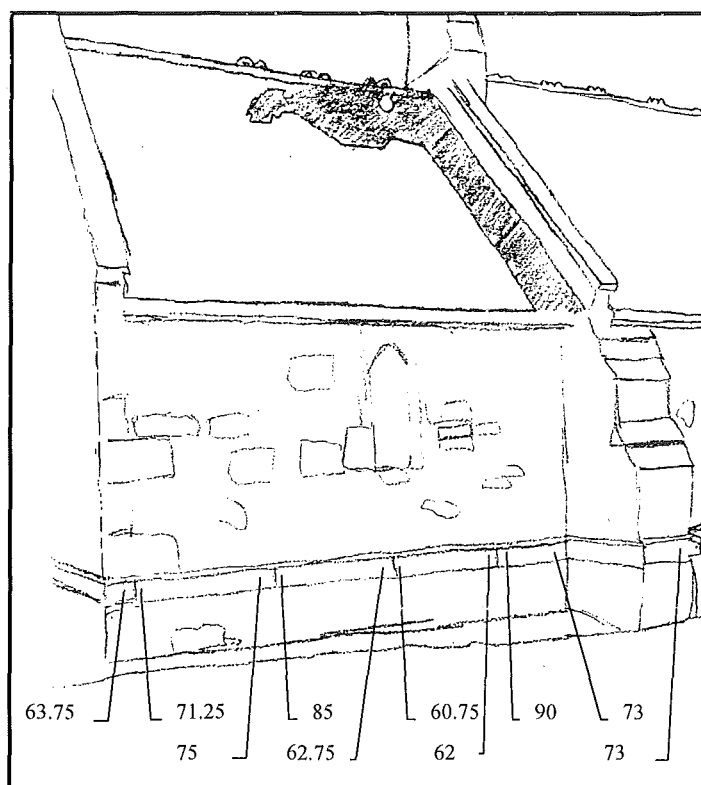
Sketch plan of Postbridge church, north facing wall.
